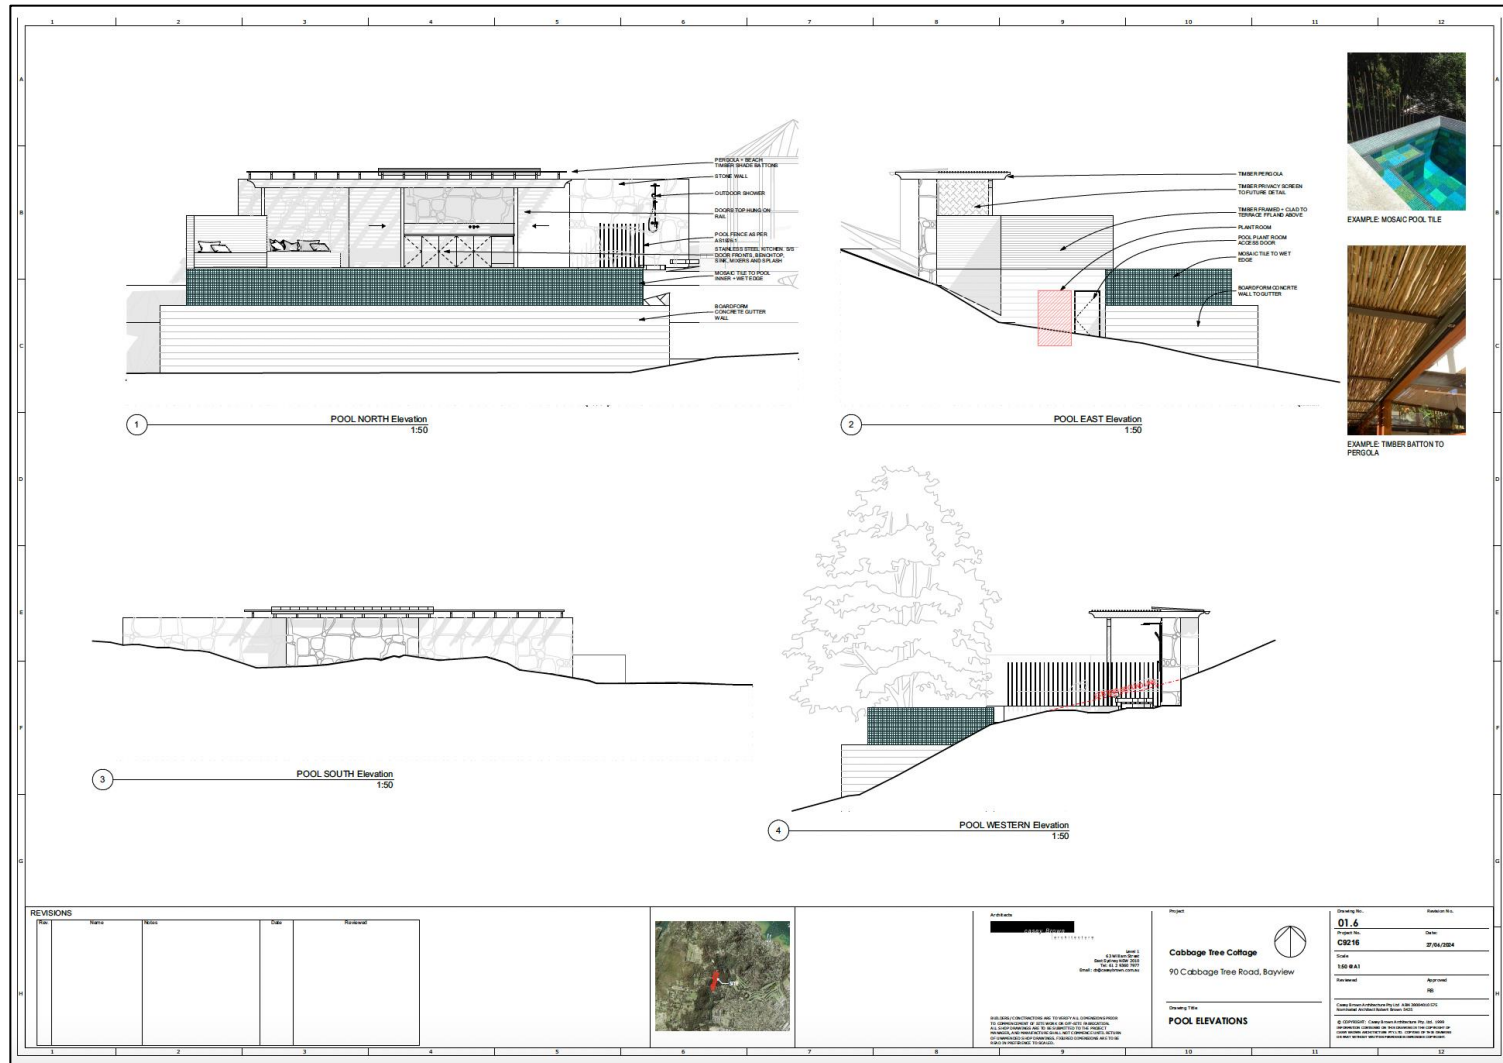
ILLUSTRATES PROPOSED ELEVATIONS
